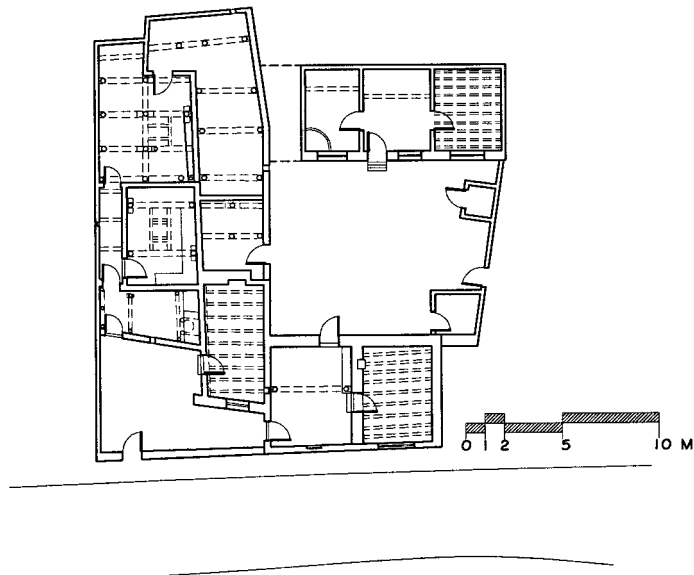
Plan of K. Zeyrek complex of three homes and cooking room, kitchen storage and barn.
